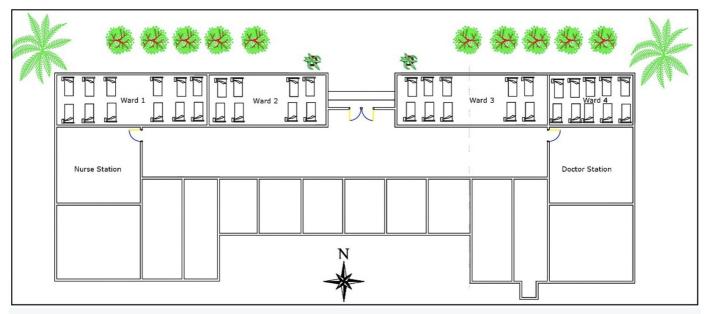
Al-Kadhimiya Teaching Hospital Ground Floor Plan (Source, authors).
